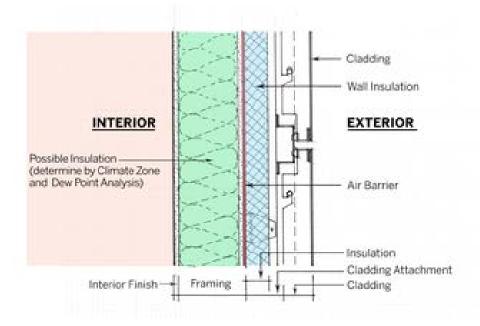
(EN35) Wall cladding attachment Figure Created by Keith Boswell, FAIA
